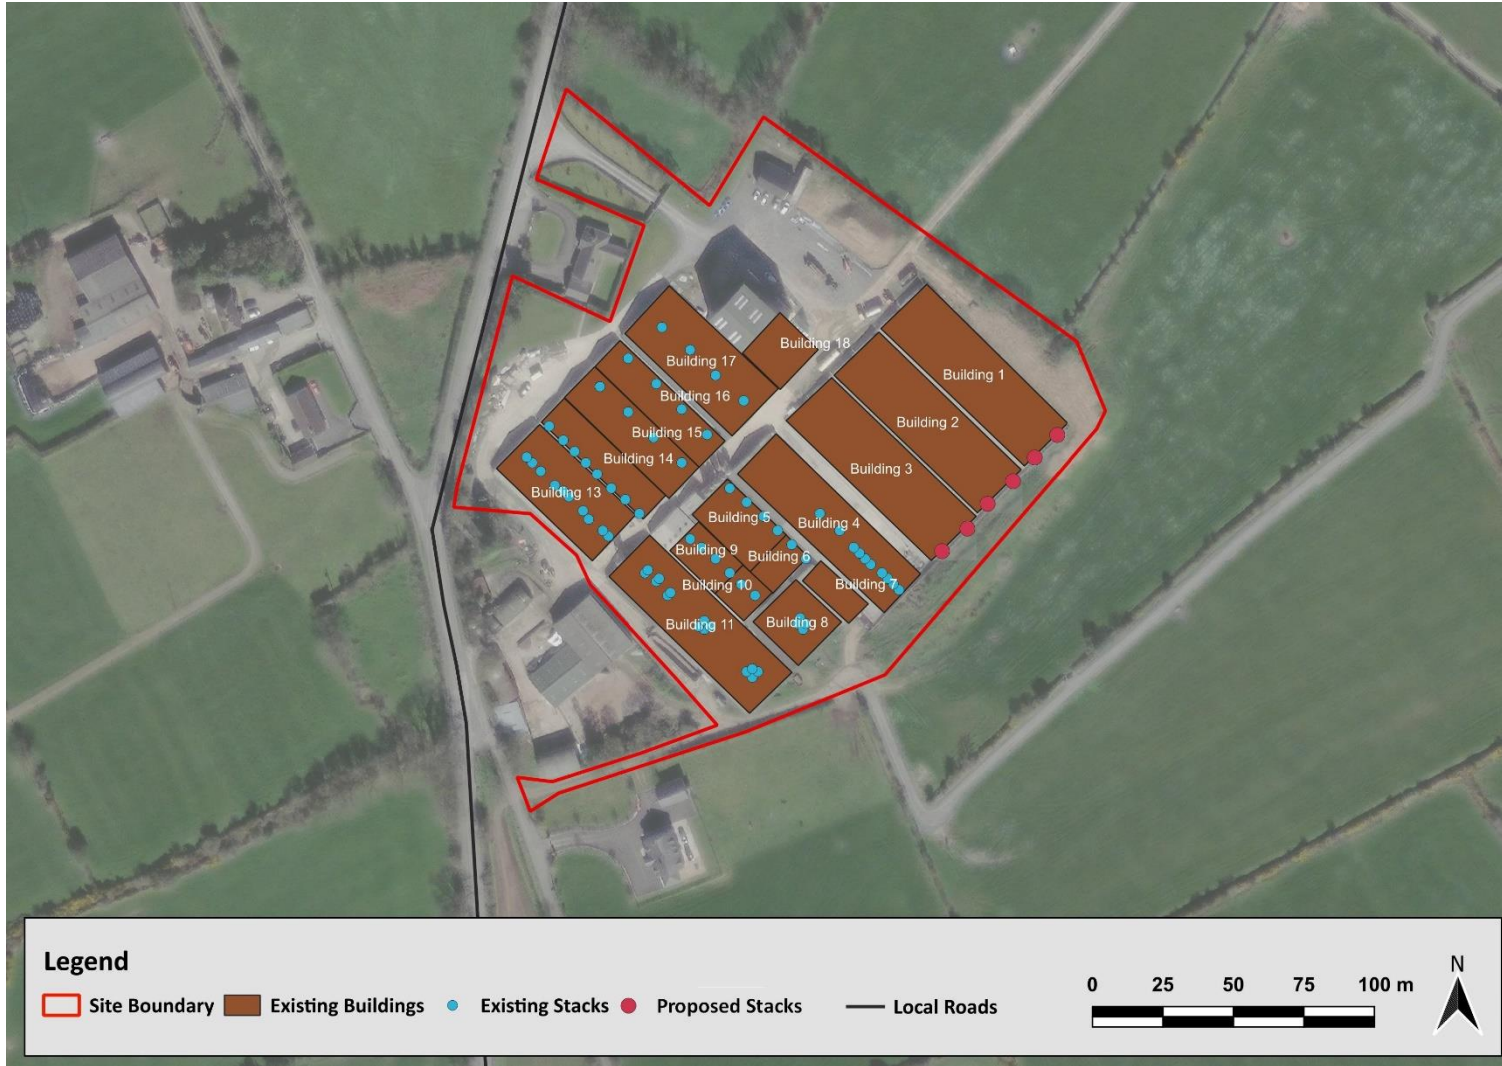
Ballyfaskin pig farm Site plan – existing and proposed housing units and existing and proposed chimney stacks
